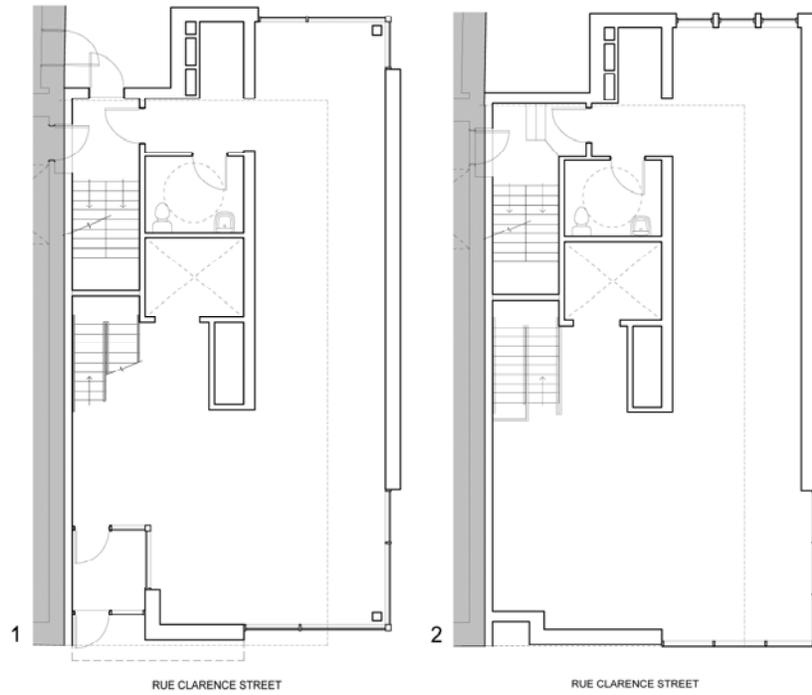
Ground and Second Floor plans of the proposed building. Credit: CSV Architects January, 2015.
